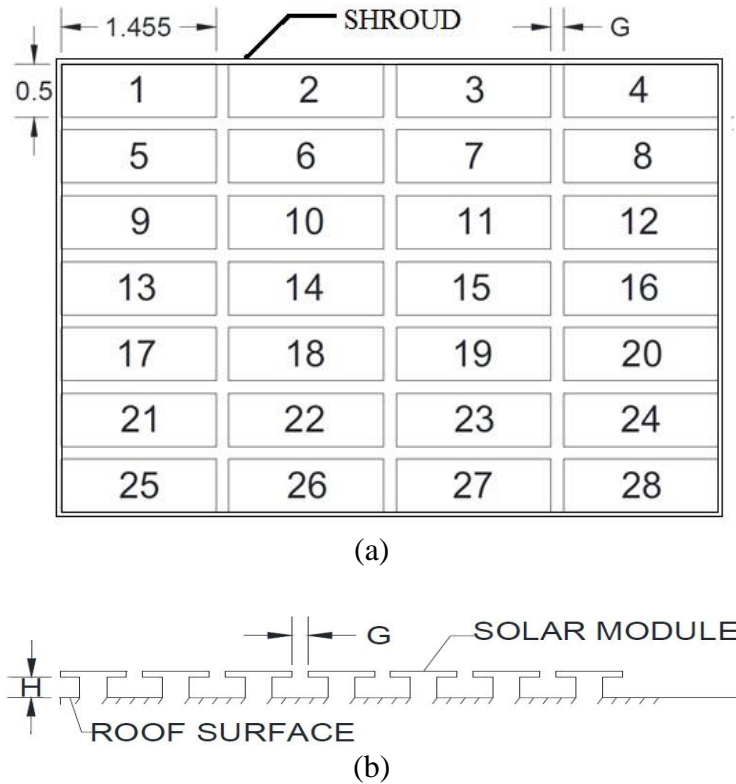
Drawings of the solar panel array showing the panel dimensions: (a) top view and (b) sectional view (Stenabaugh, 2015).
